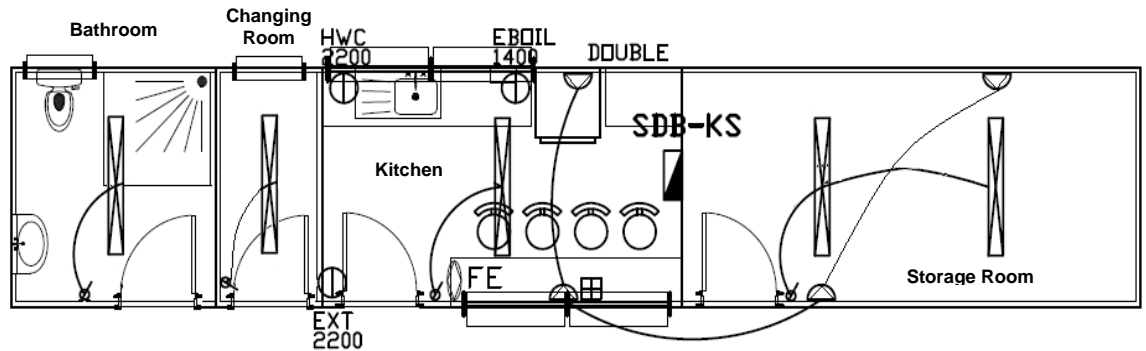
Bathroom, changing room, kitchen and storage room layout.
